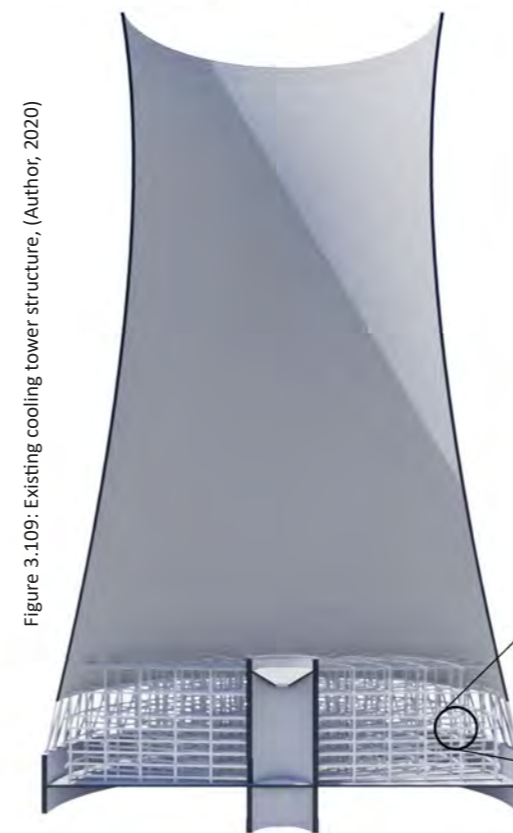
Existing cooling tower structure, (Author, 2020)
